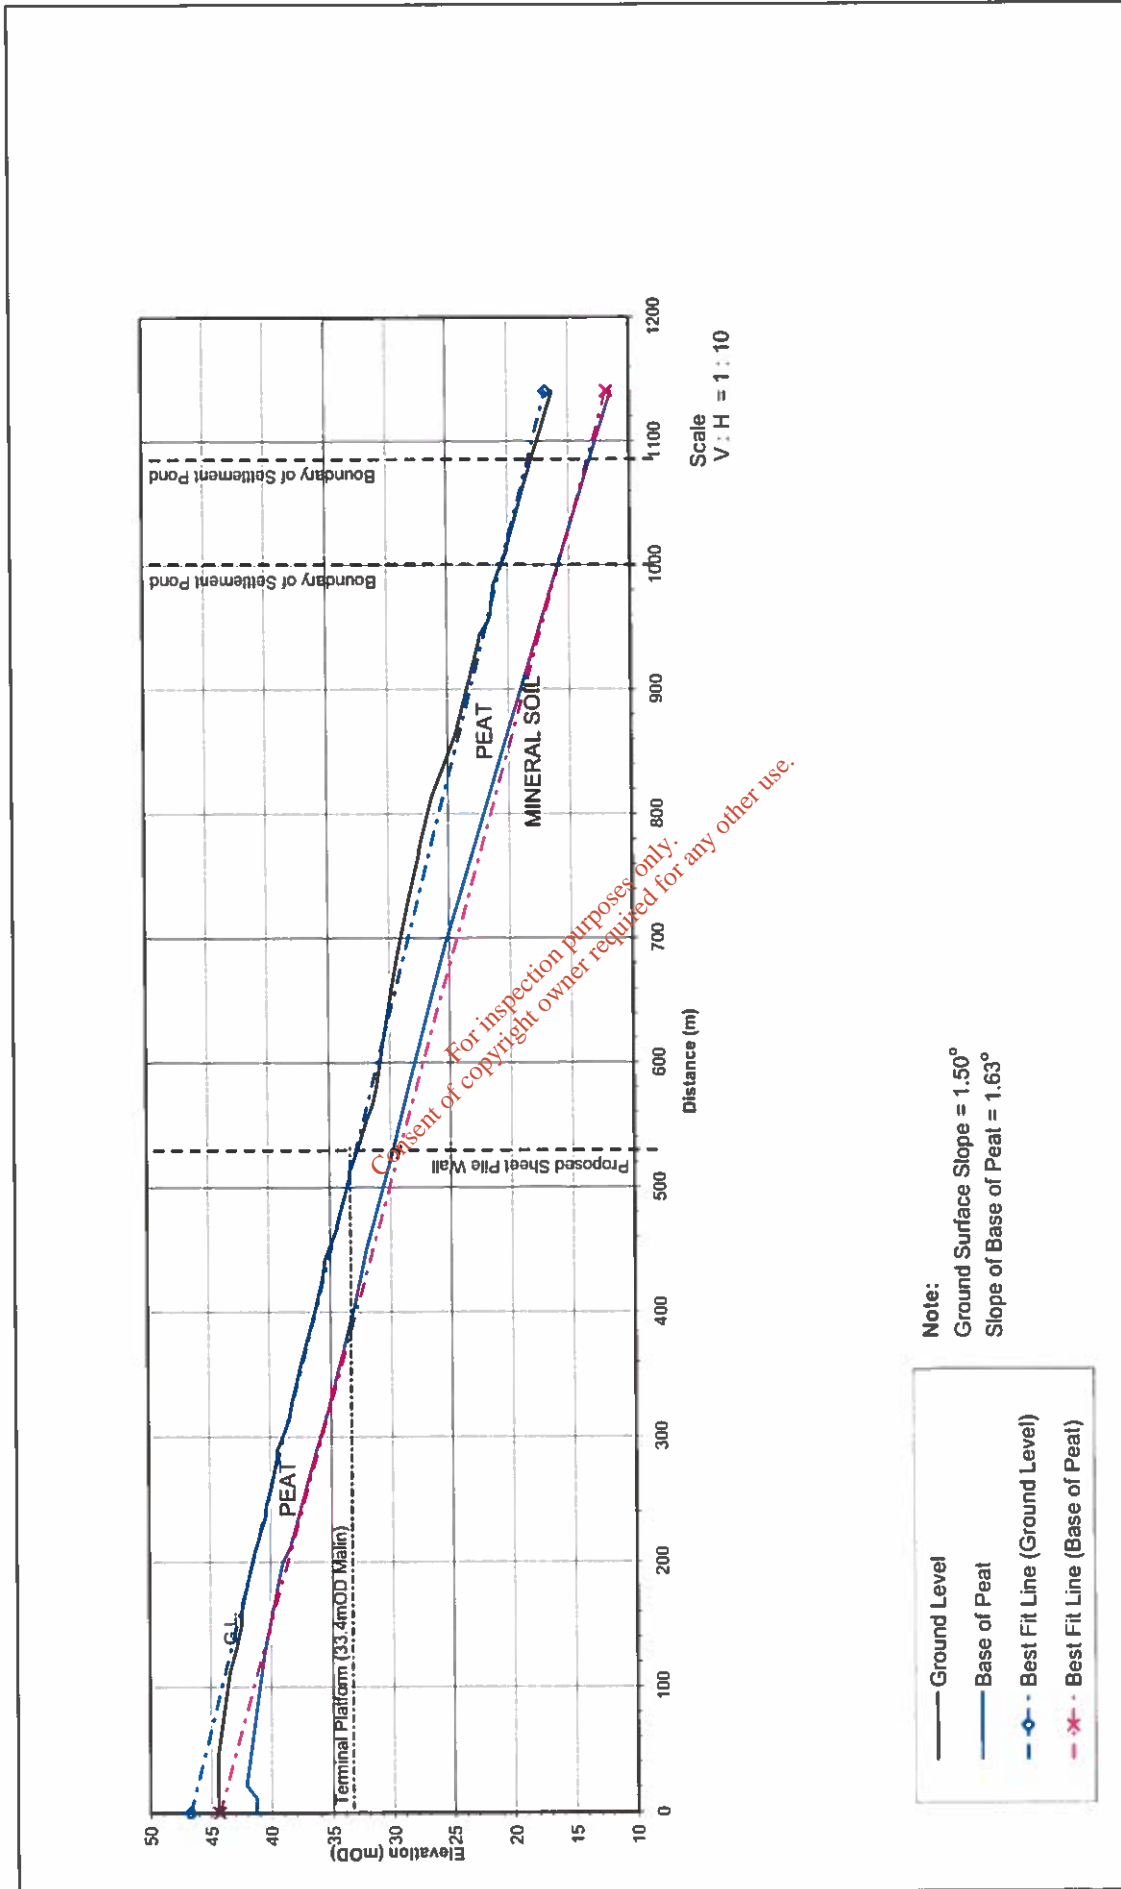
Typical Cross-section along Western Area and Settlement Ponds (Cross-section 1)
